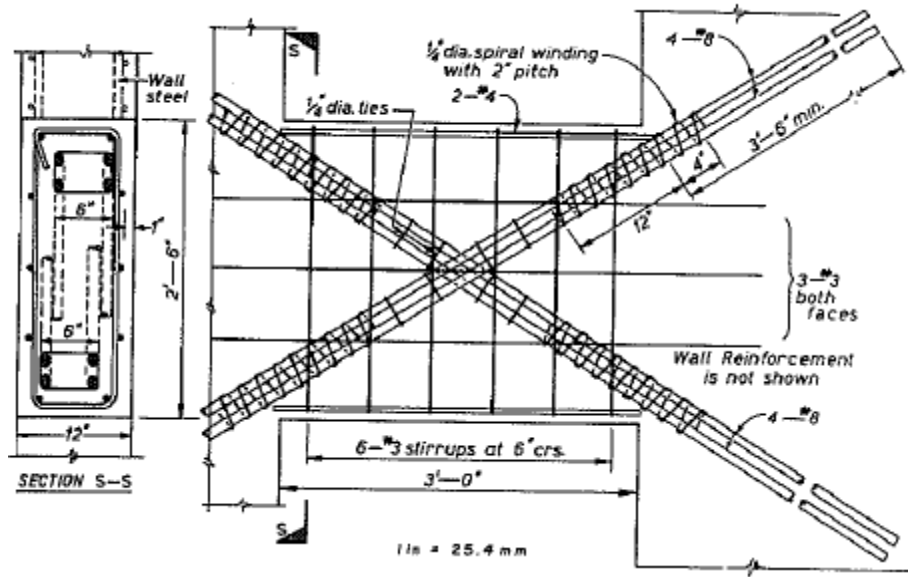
Proposed coupling beam reinforcement (Park and Paulay, 1975)
